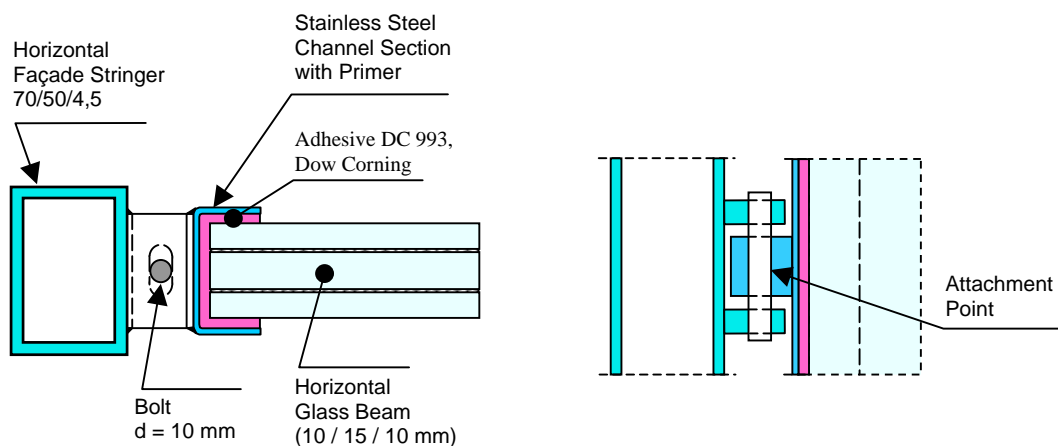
Bonding Design Glass Façade Herz Jesu Church
